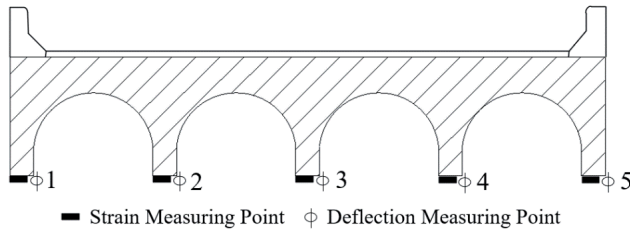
The arrangement of arch rib deflection and strain measurement points
